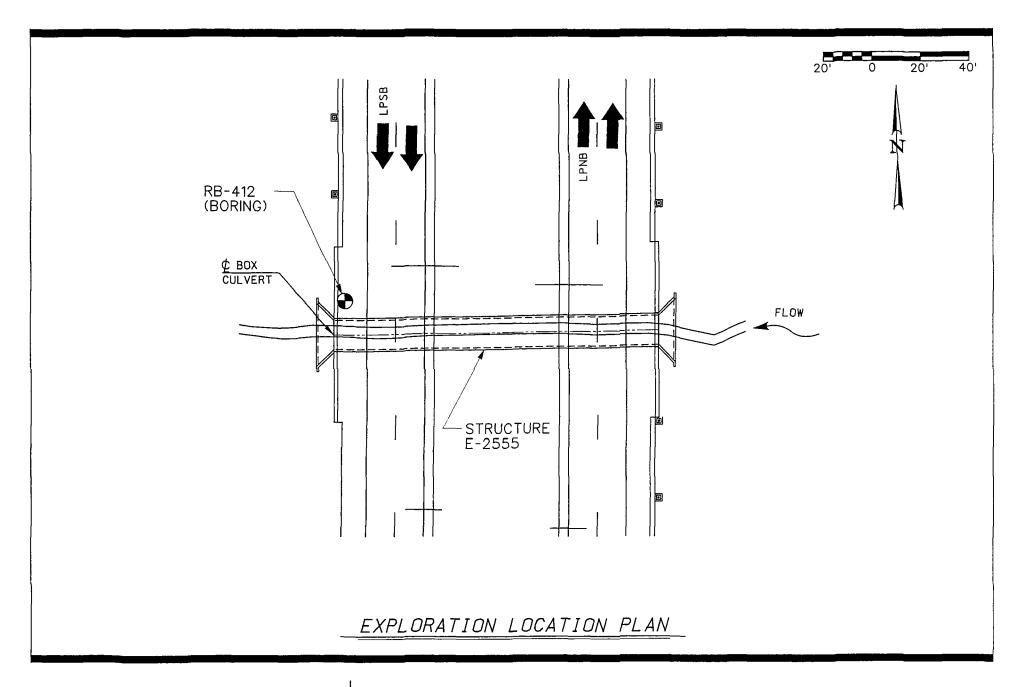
SITE PLAN & TEST HOLE LOCATIONS
